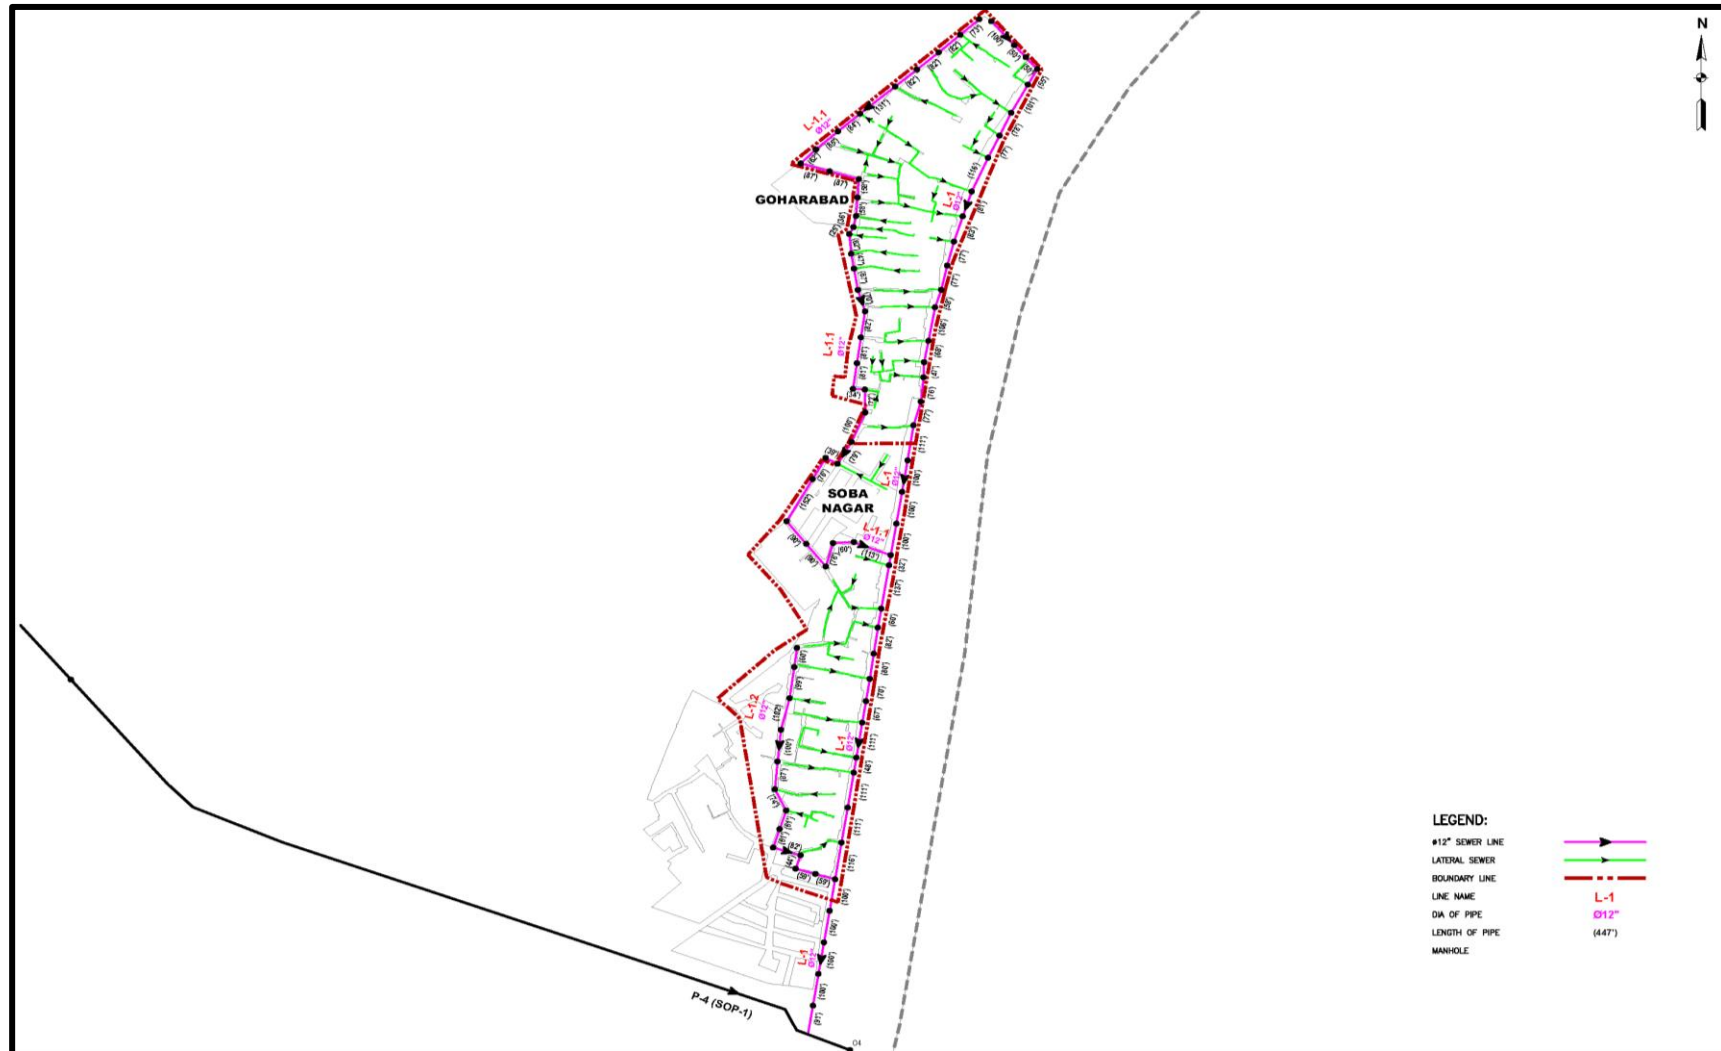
Layout Plan of Proposed Sewerage System in Sobanagar/ Goharabad
